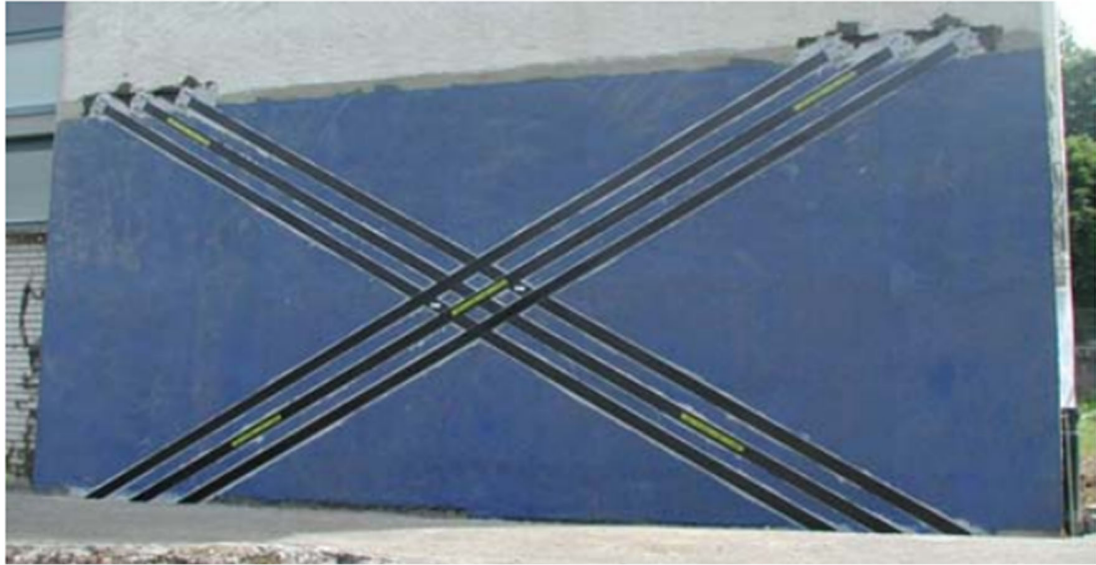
Seismic retrofitting of a masonry wall using GFRP fabric and CFRP strips , (Motavalli et al., 2010)
